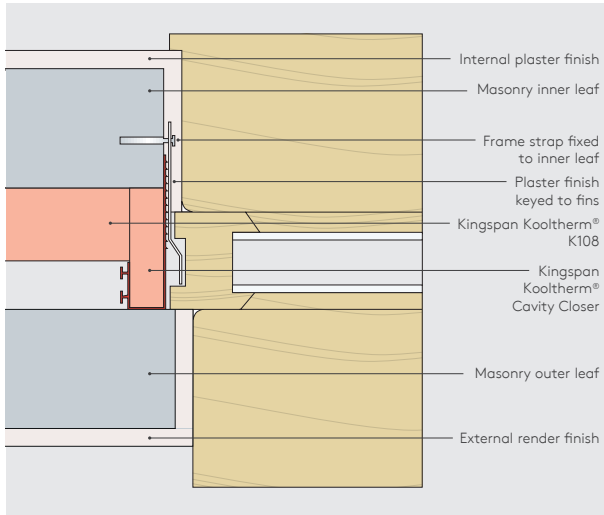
Jamb Detail Incorporating Kingspan Kooltherm® Cavity Closer at a Check Reveal
